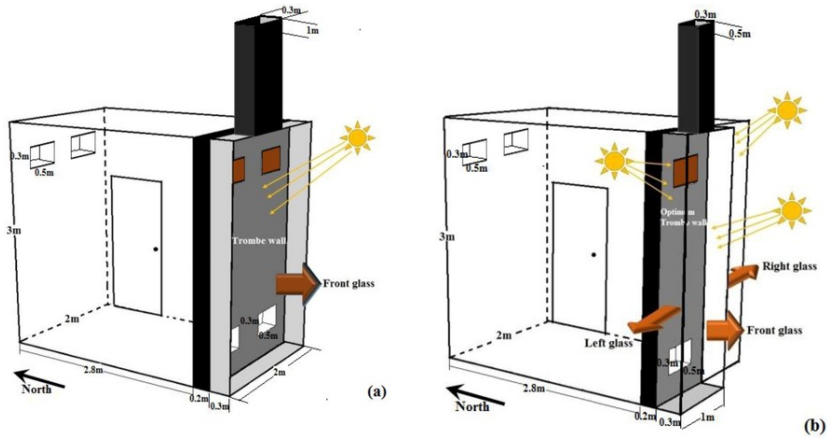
Schematic of (a) normal Trombe wall and (b) new designed Trombe wall.
